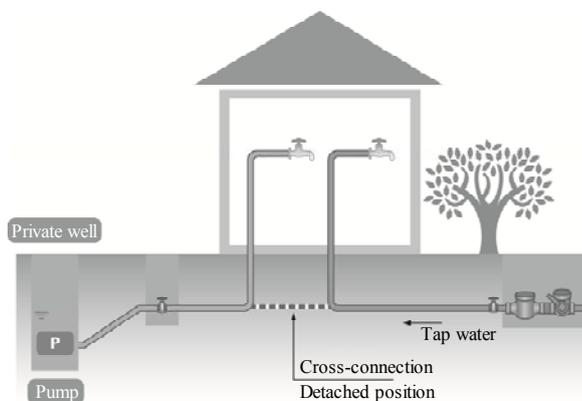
An example of piping to which connection of water service pipe not to be made
